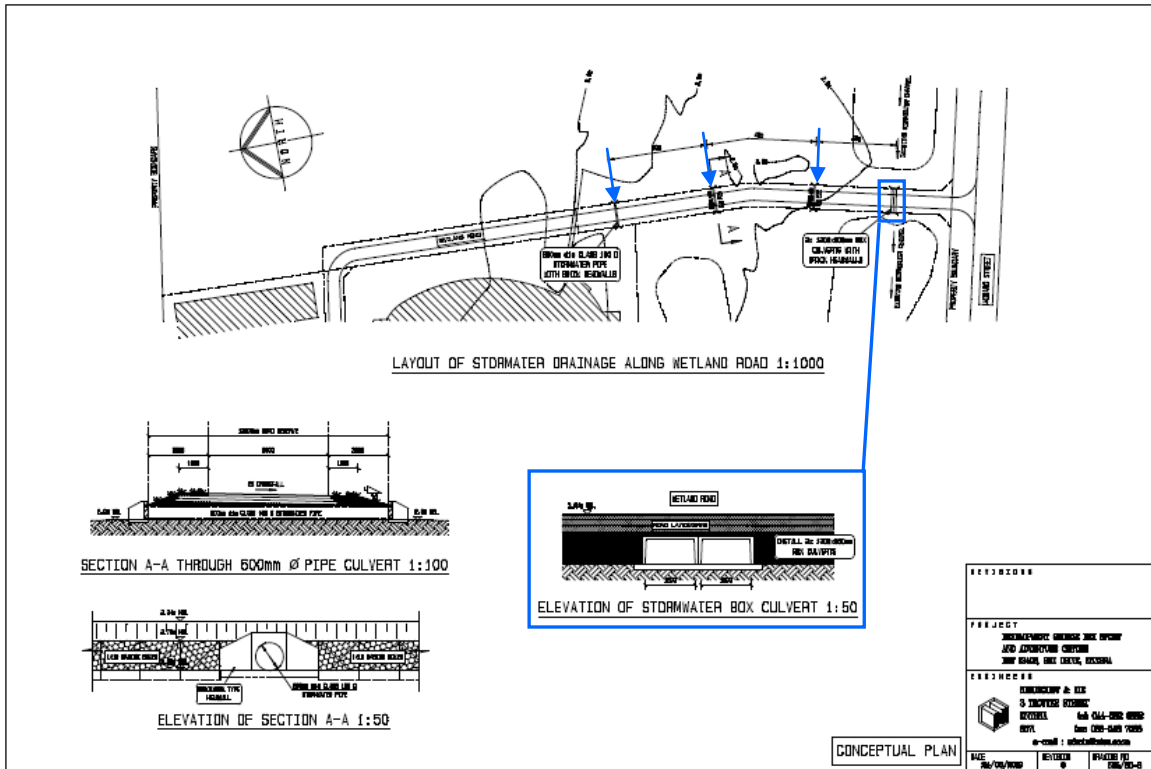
Proposed layout and cross-sections showing stormwater management of the access road from Howard Street to the sports complex.
